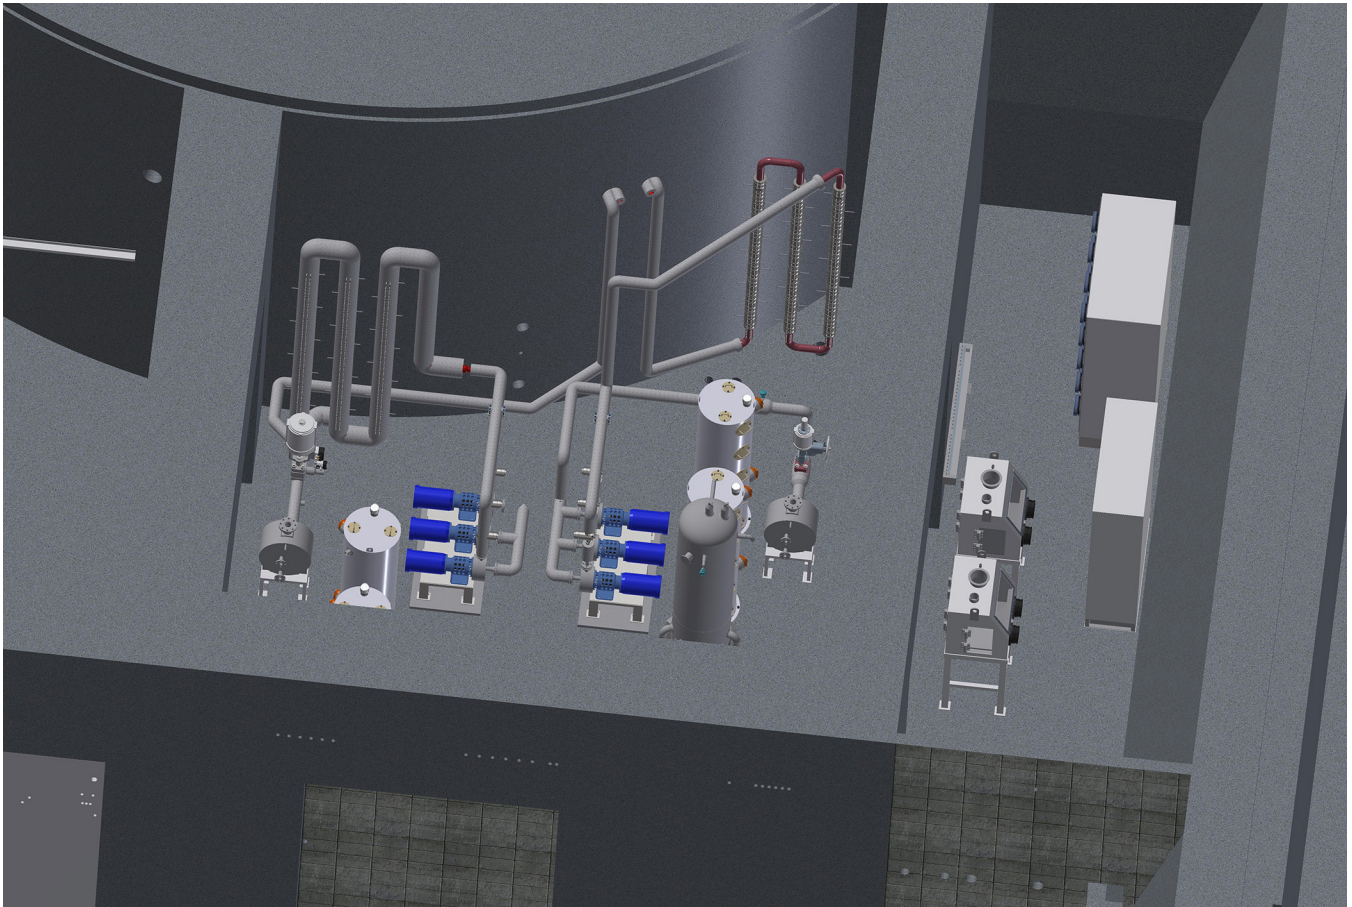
I-loop system equipment layout in 1A primary and secondary cubicle
